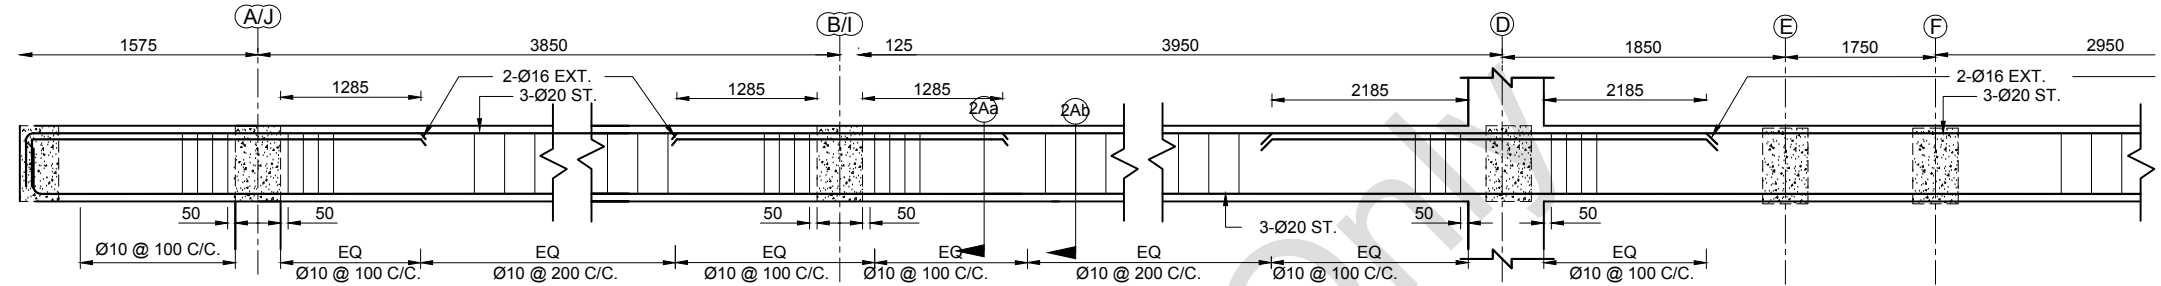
DETAILS OF FIRST FLOOR AND ABOVE BEAM
